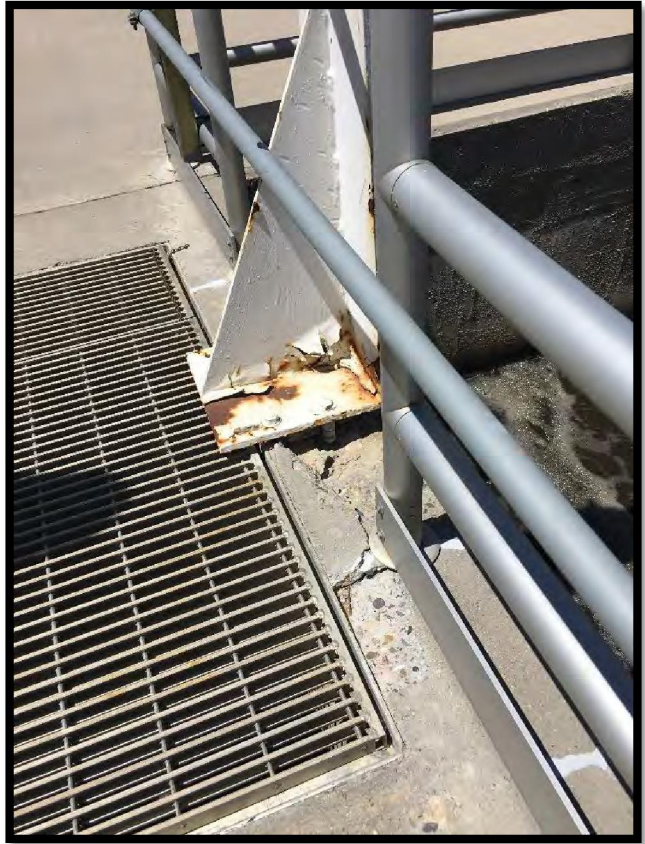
A&B, Aerobic Basement Ceiling Crack
